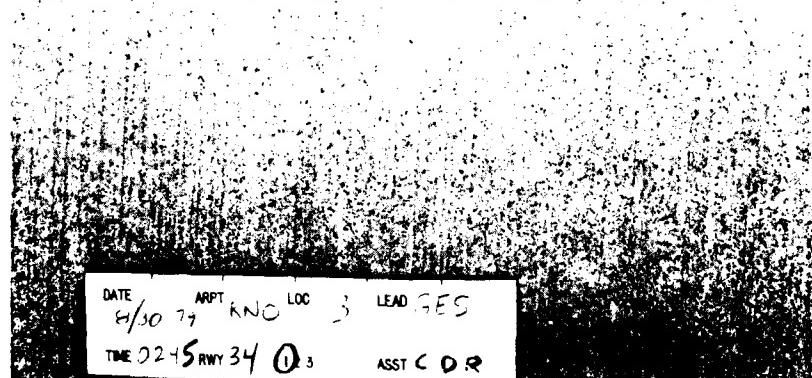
BROOMEED OR BRUSHED CONCRETE
